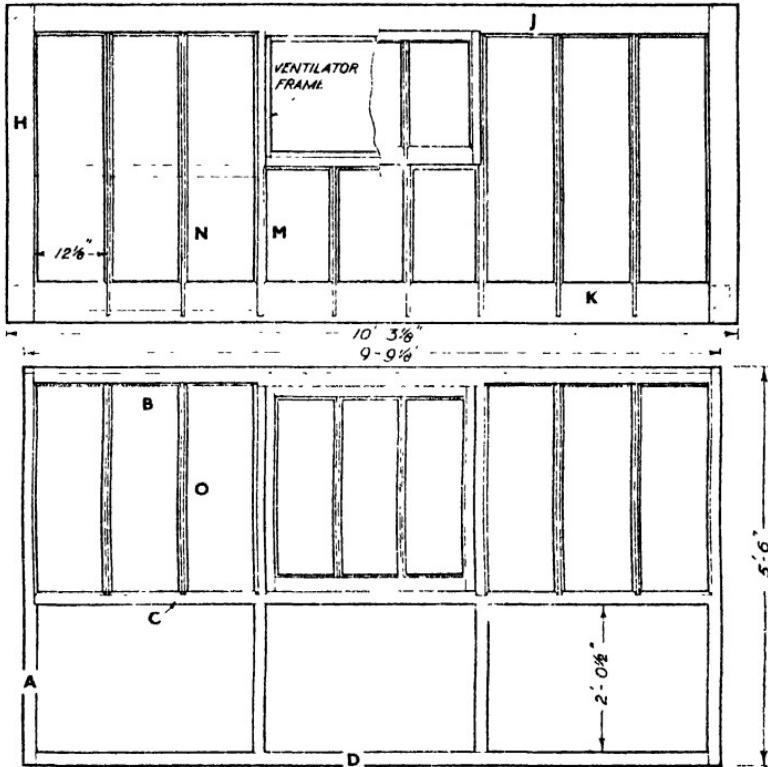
ROOF DETAIL AND ELEVATION OF SIDE.
